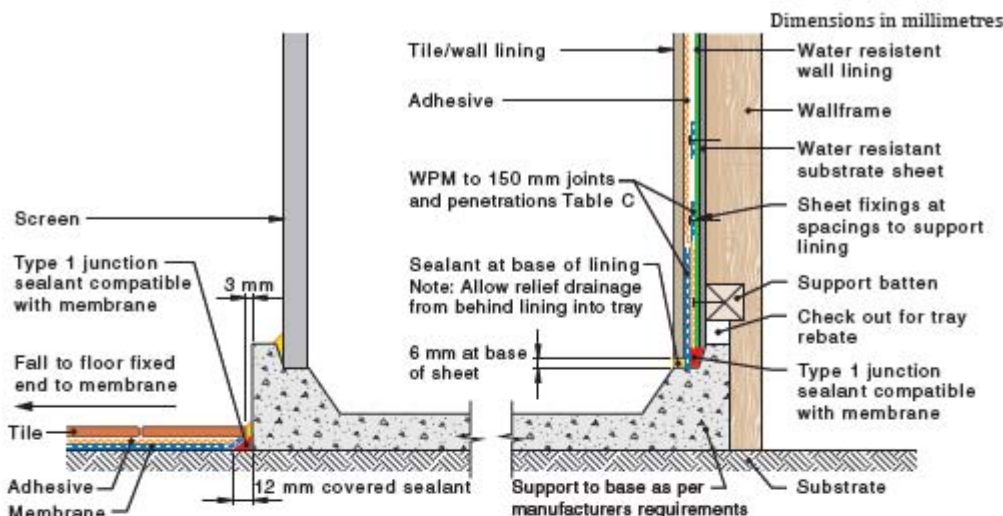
(C) — Preformed shower base checked into wall, frame or render
